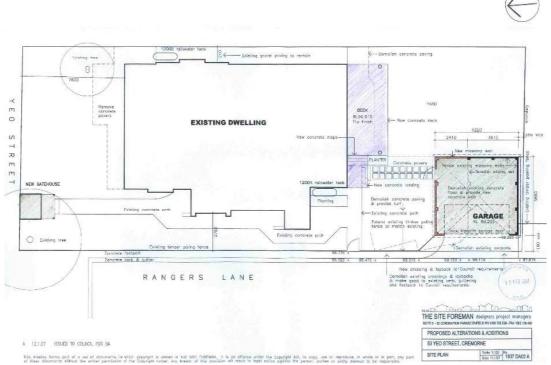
Proposed site plan, prepared by 'The Site Foreman' in January 2007, as submitted with DA 56/07 (Source: North Sydney Council Archives, DA 56/07)
